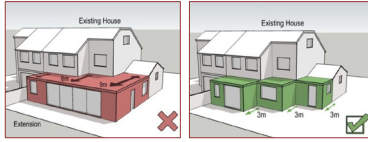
Infill extensions: the stepped appearance of the original house should be maintained, as illustrated by the drawing on the right.
